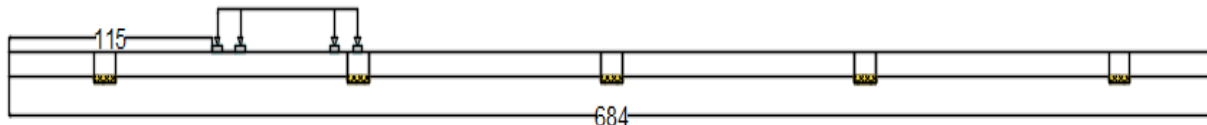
Location of P-15 truck for 12 ft girder spacing deck slab (Case 1, unit: in)
